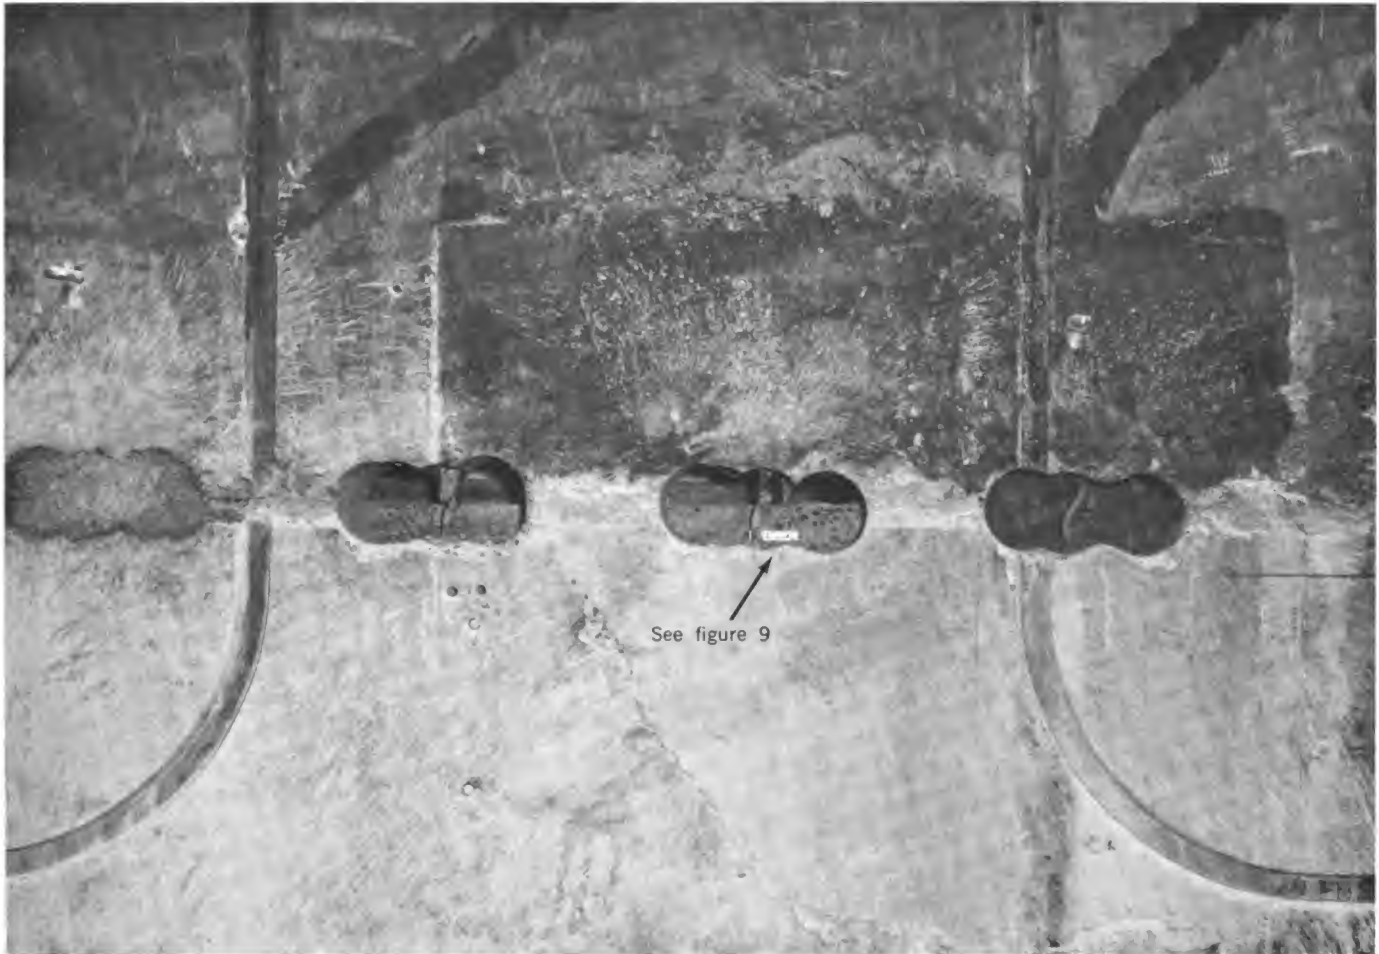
Museum for Antique Cars. Typical keys cut in walls at fractured horizontal construction joints.
